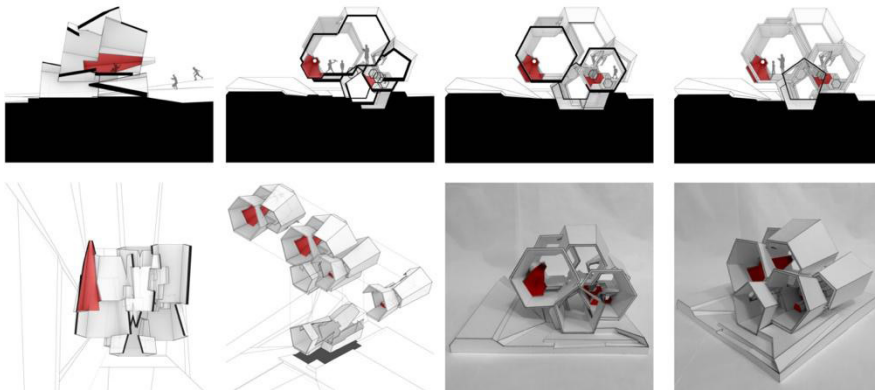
Kindergarten Project ex.2 in Architectural Design Studio 1 - plans sections and model.
